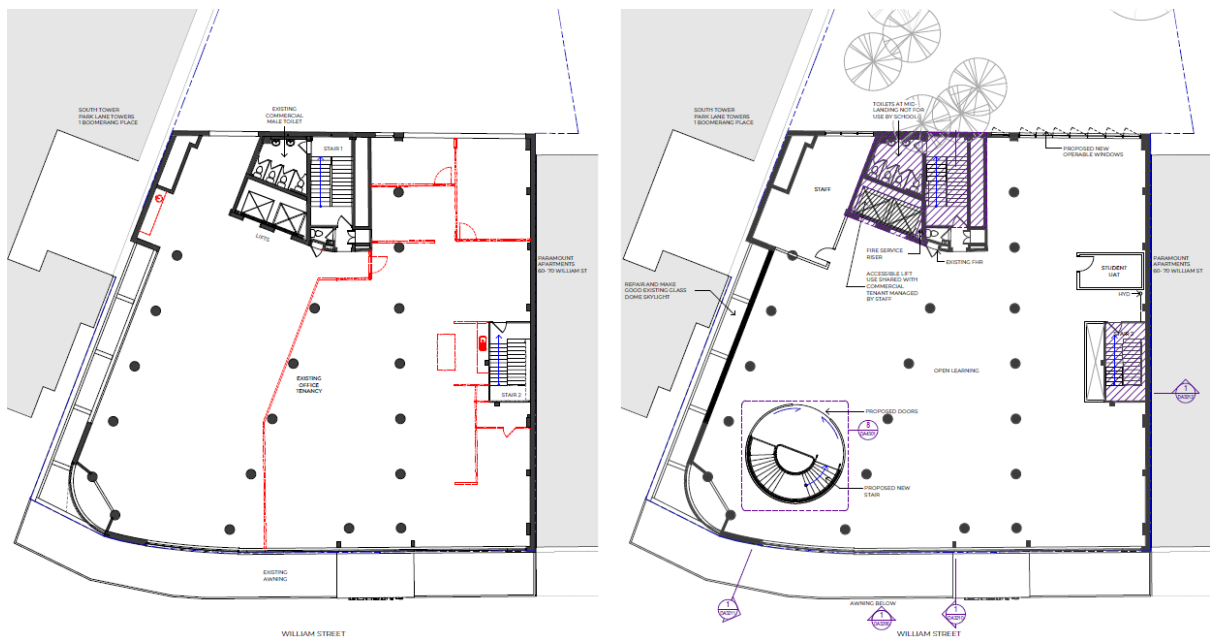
Proposed level 1 demolition (left) and proposed level 1 floor plan (right)
